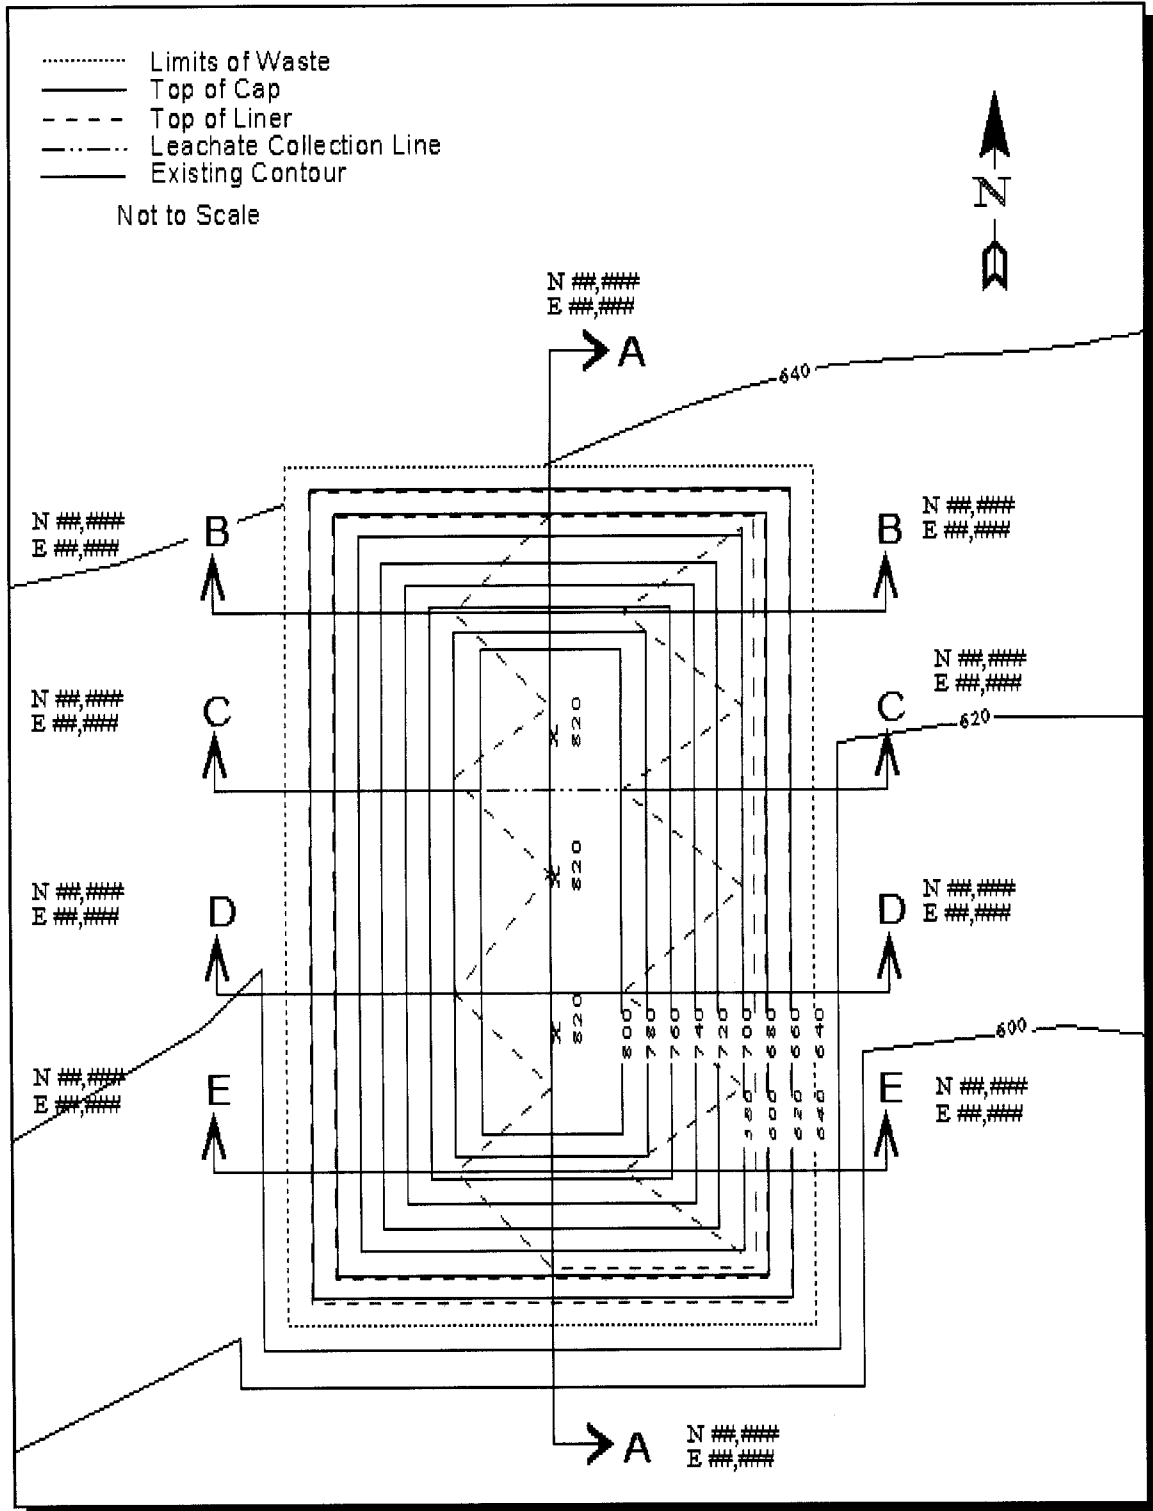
Example plan view showing top and bottom elevations and the location of cross sections that were analyzed for stability.
